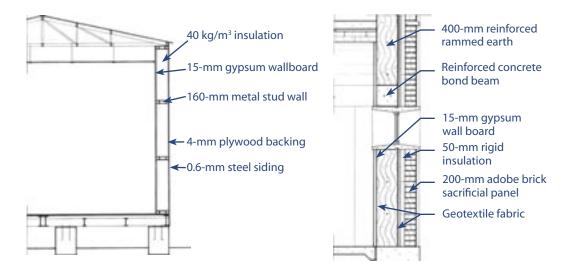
Comparison of prefab wall (viewed from side) and indigenous design wall (viewed from above)
